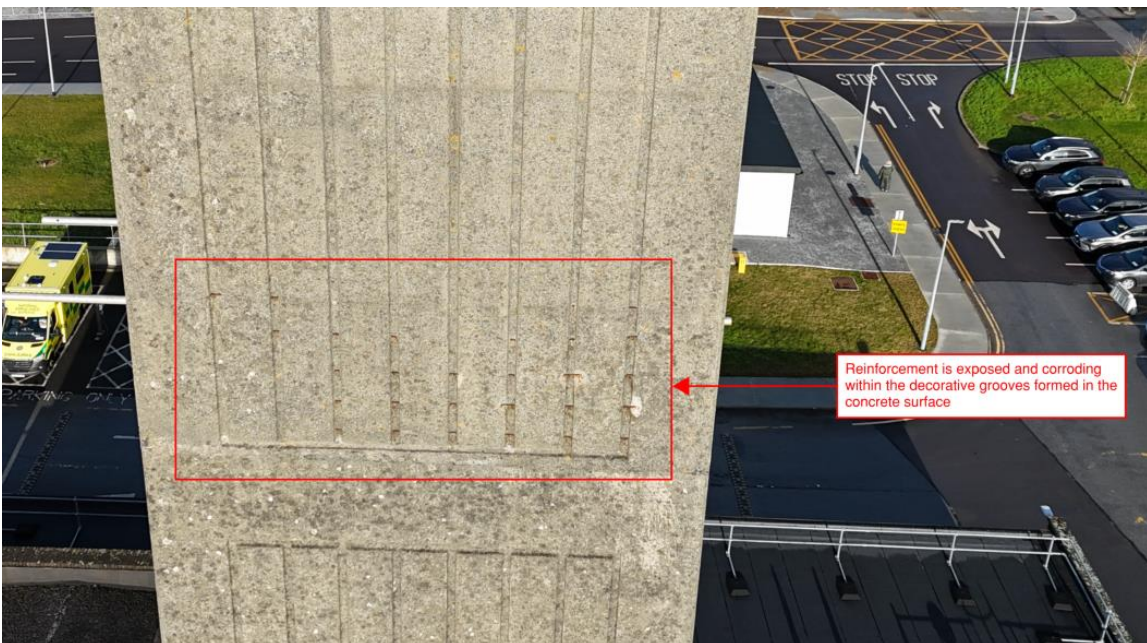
Exposed corroding rebar visible in grooves in concrete wall on southern elevation
